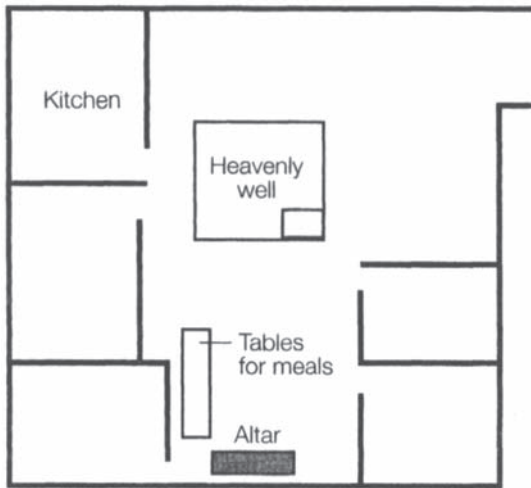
Floor plan of side-entrance to Chinese peasant house (Source; Newell, 1962:102)
